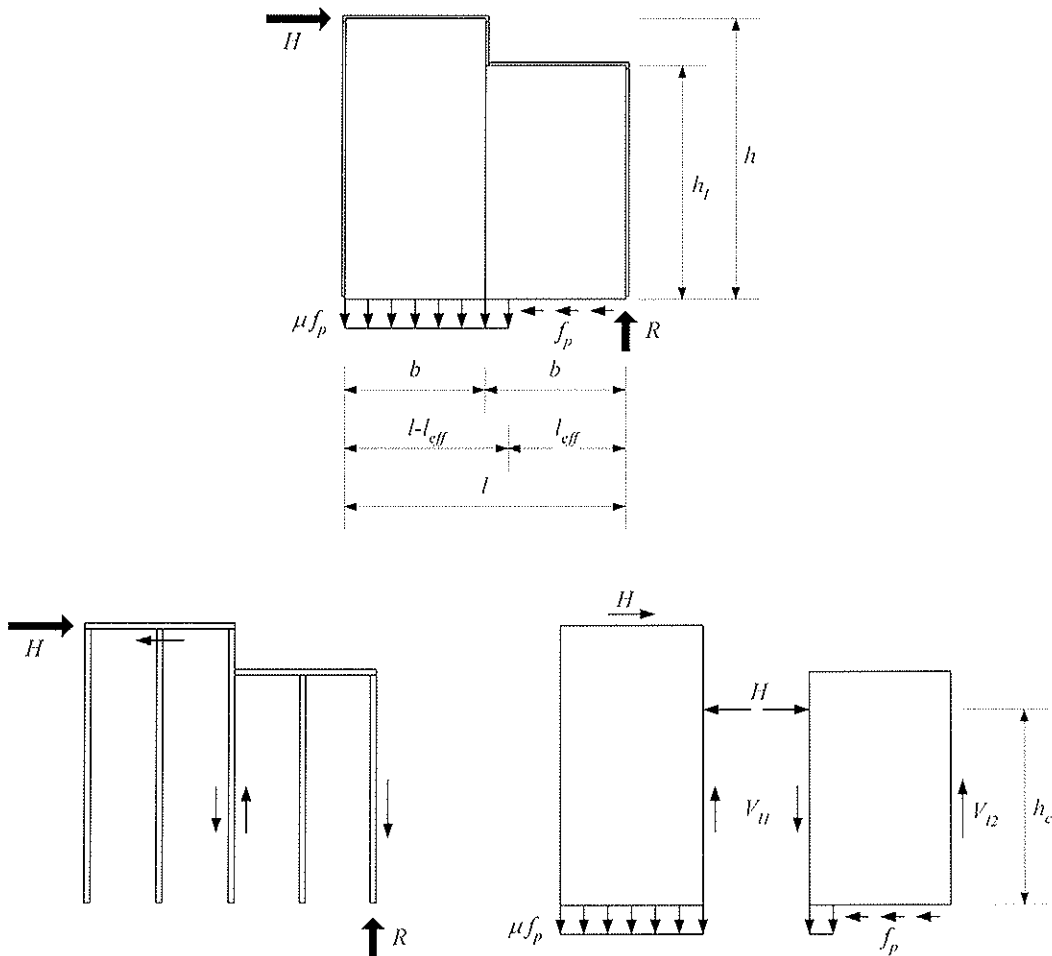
Forces acting on a shear wall in the case of a low sheet on the leeward side ($h_l \geq h_c$).
